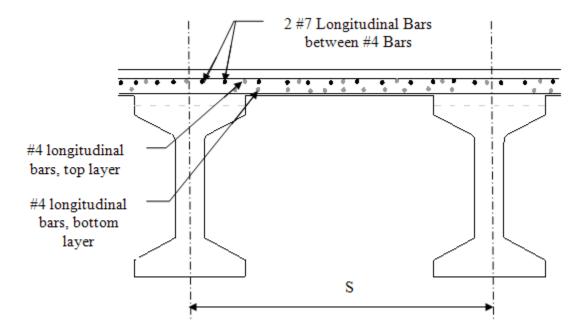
Section view through an intermediate bent at a construction joint with 1987 reinforcement layout (modified from GDOT SR 46 Over Oconee R. plan)
